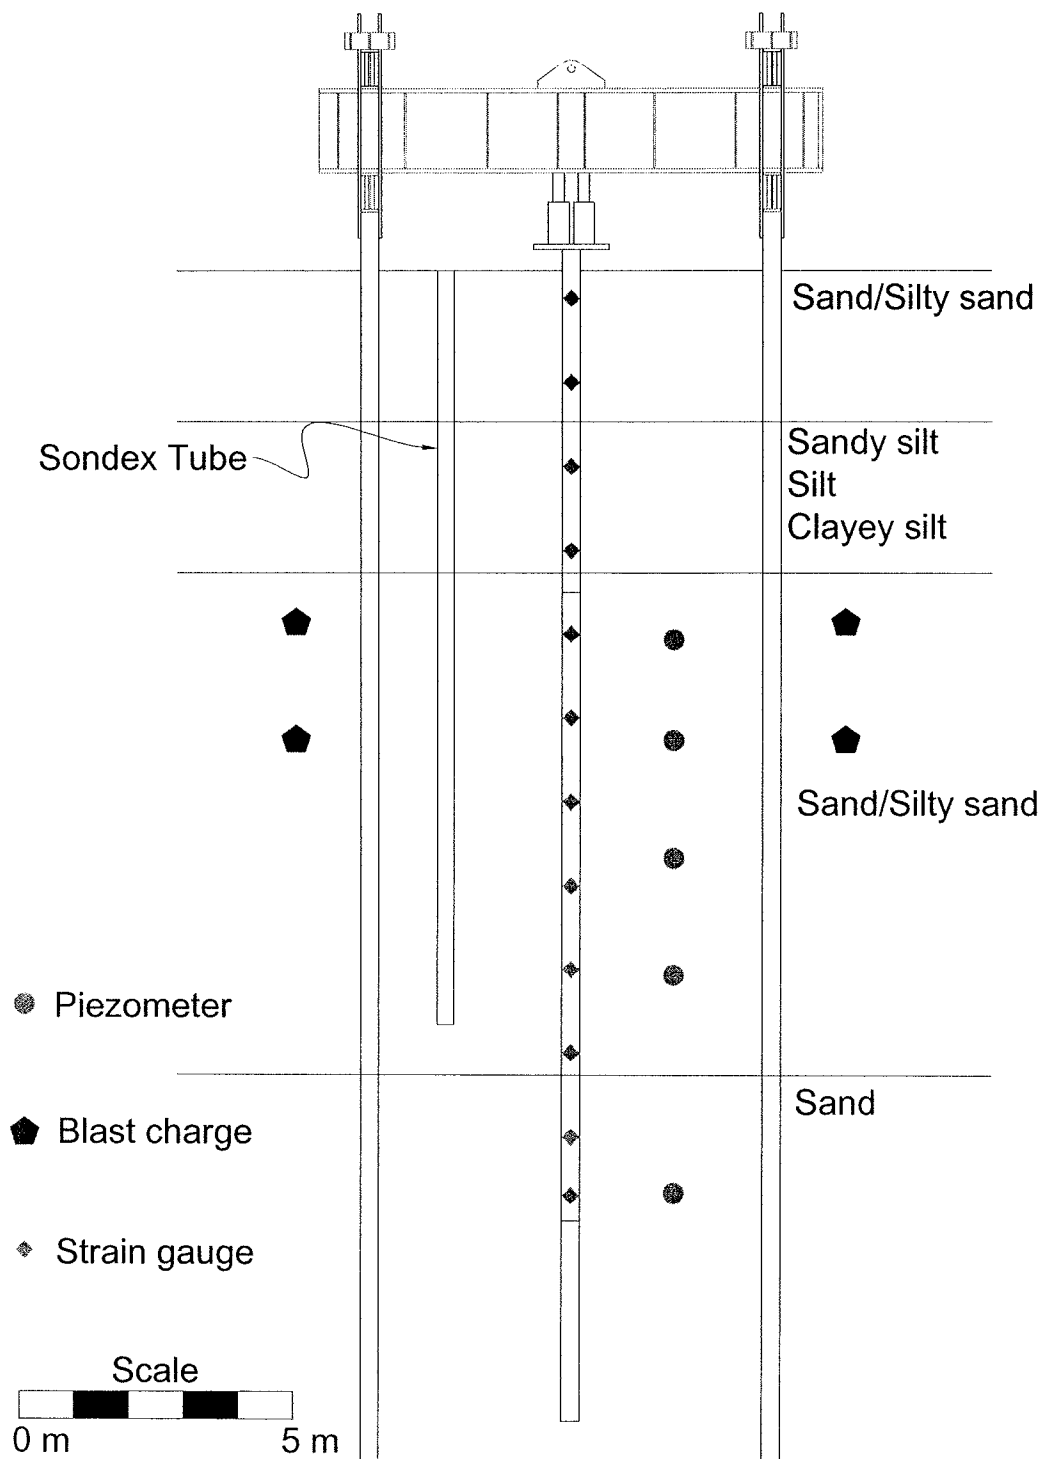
Profile view of pile foundation and instrumentation layout at Site 2.
